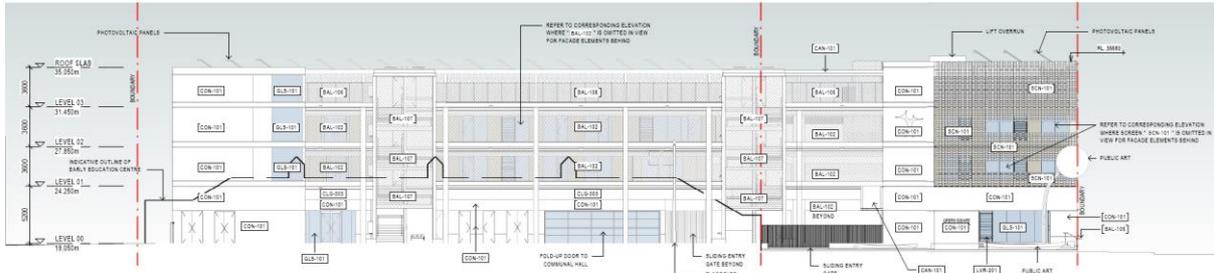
| East Elevation with Flexi-Brick screen (Source: BVN)
